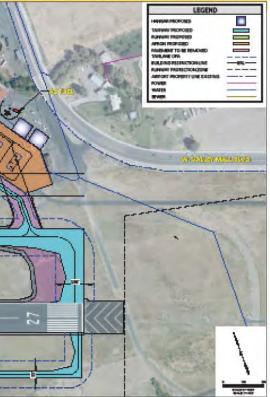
Airport Layout Plan Update – Proposed Improvements
